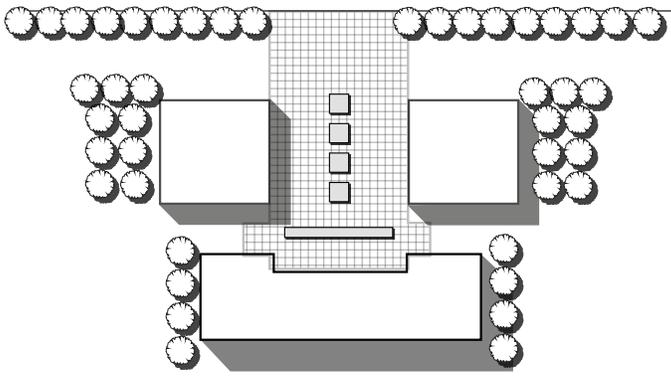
Buildings should frame and enclose outdoor gathering places
